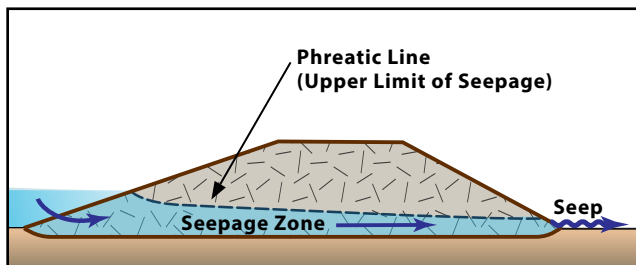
Typical Embankment Section Showing Phreatic Line Exiting Above Downstream Toe
